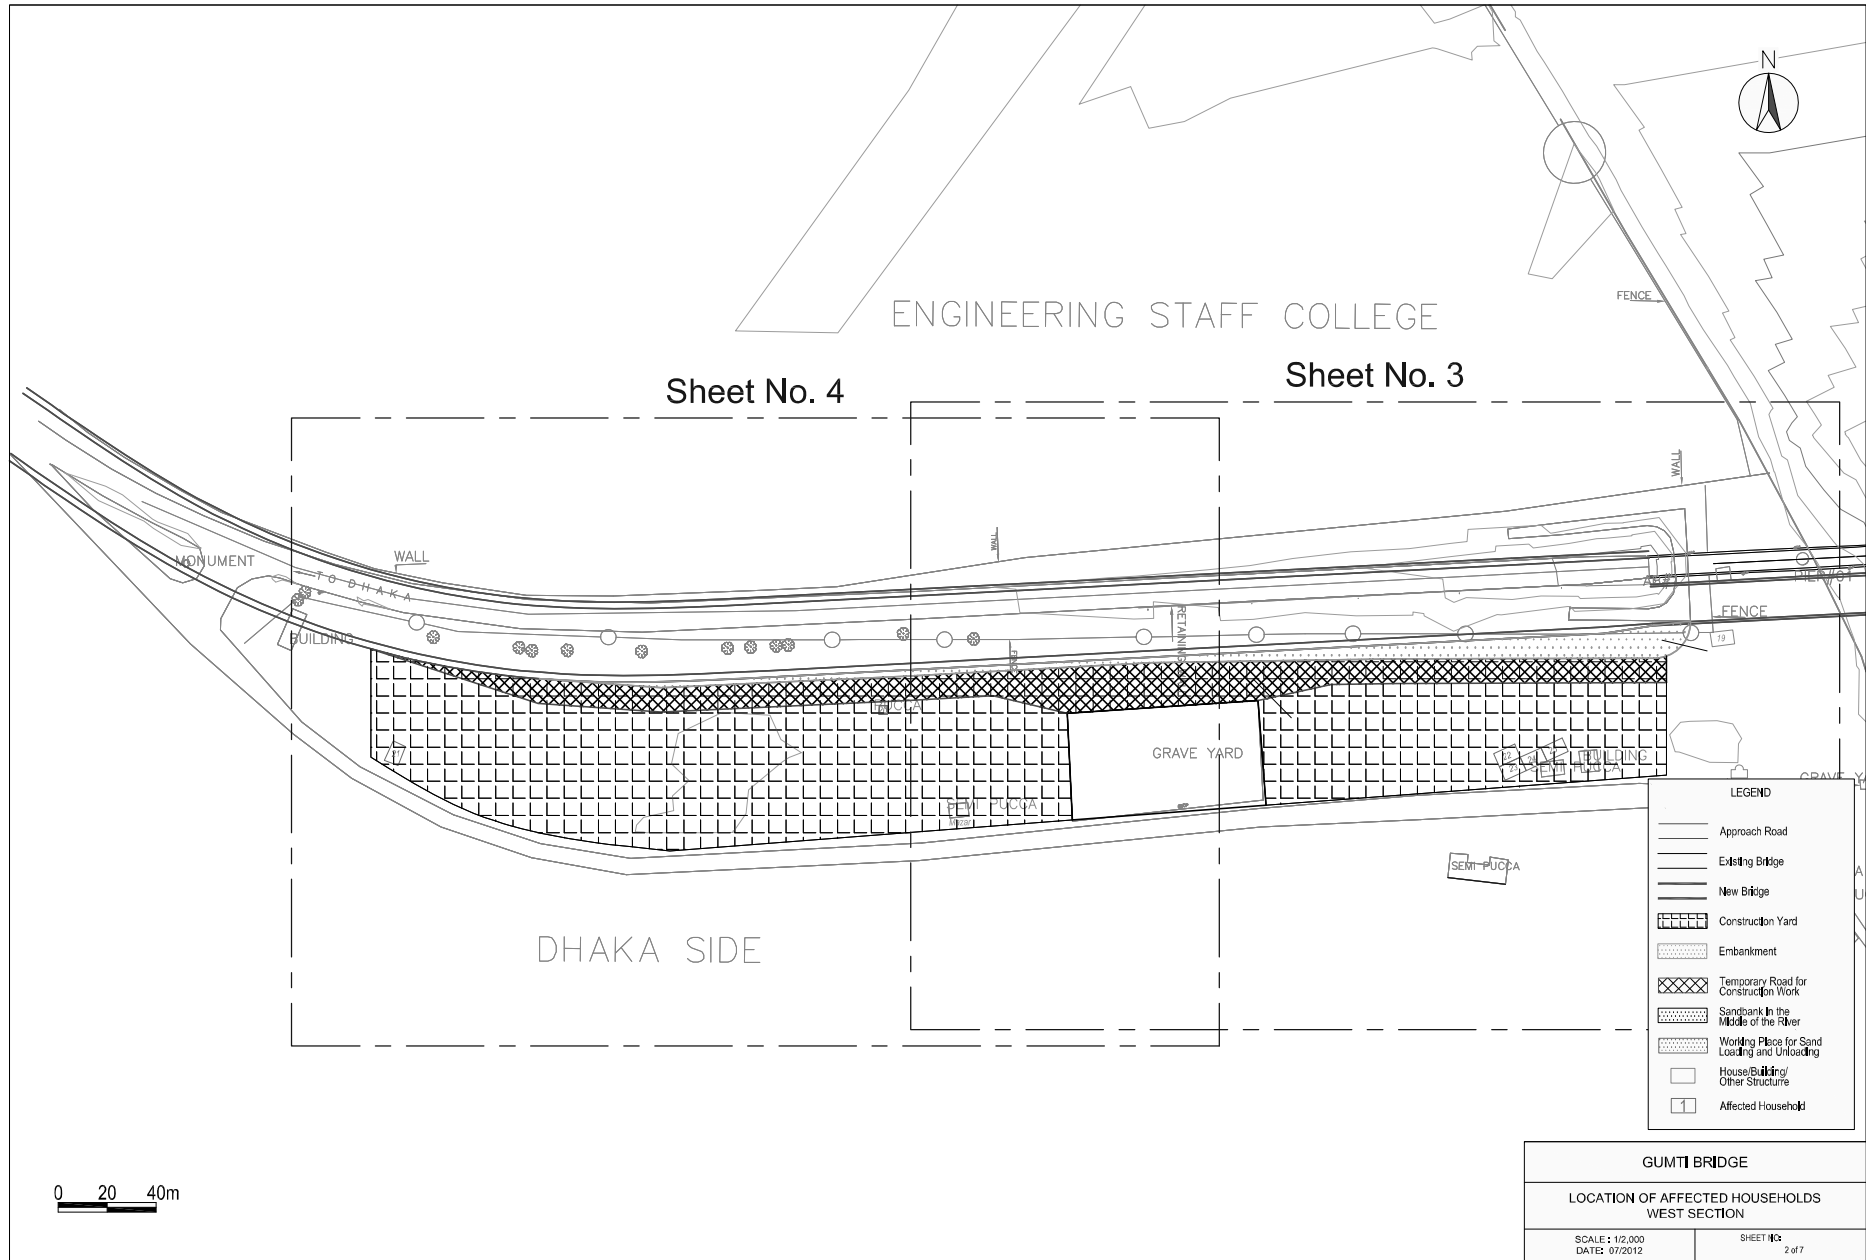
Location of Affected Households West Section (Sheet No.2)
